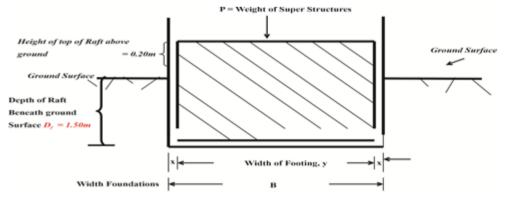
Schematic Representation of the Gas Processing Plant Building on Raft Foundation
